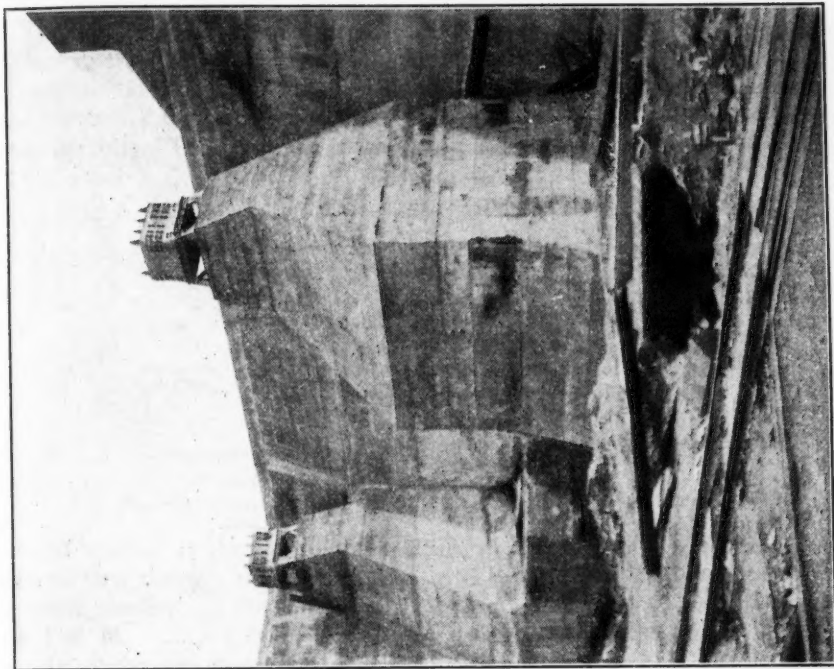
STEEL FOOTINGS ENCASED IN CONCRETE.
